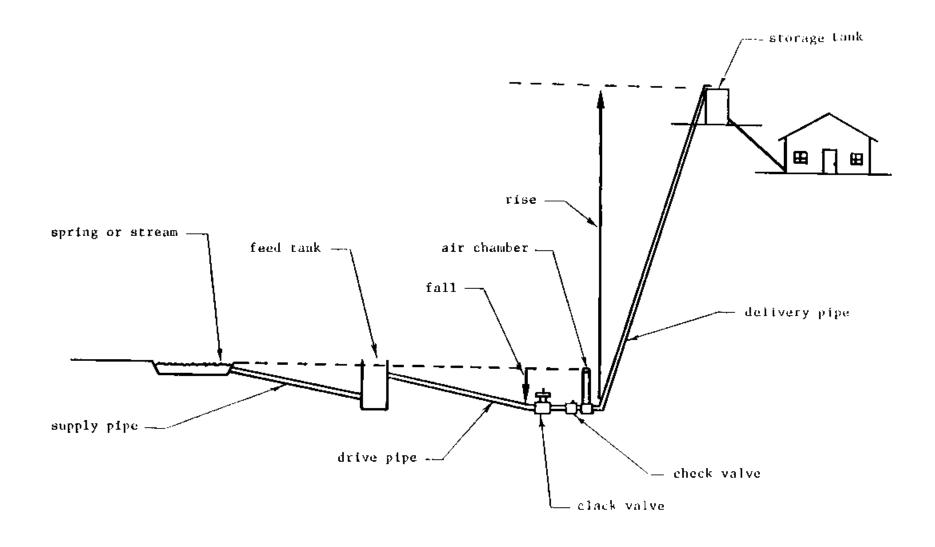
Schematic of a ram pump installation (adapted from D & P Manufacturing brochure).
